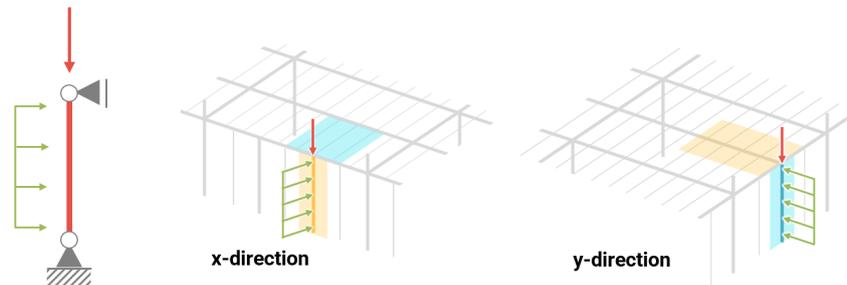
Facade column pinned at both ends, subjected to vertical loads at the top and horizontal distributed loads along the height
